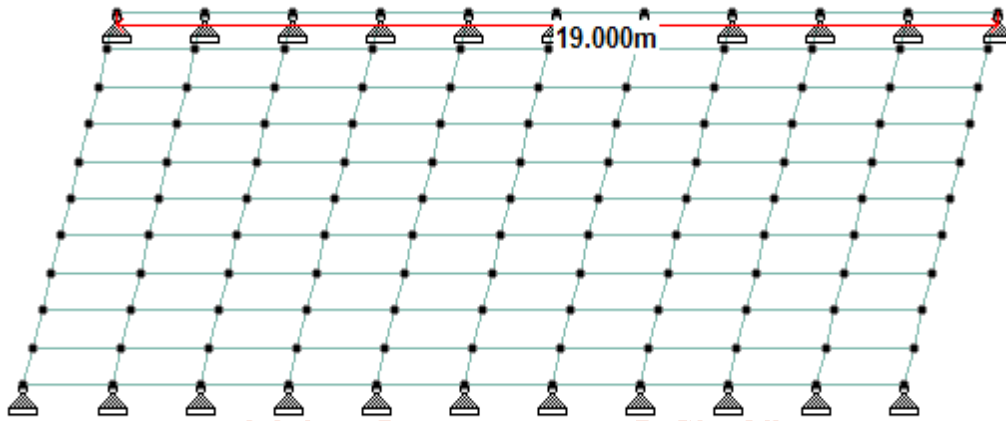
Plan view of slab with 19m span length at 15° skew angle
